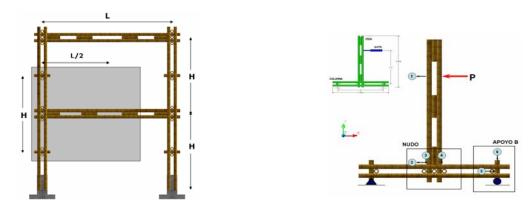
Beam-column connection: Localization in the frame, drawing of the connection
